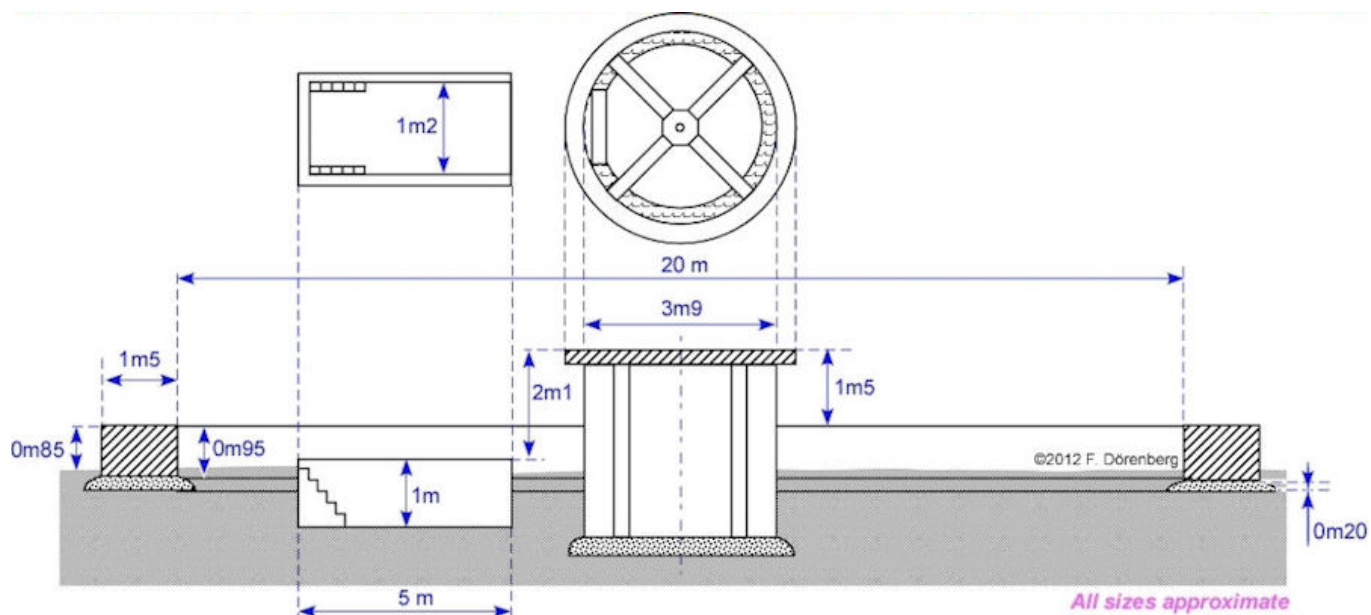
Cross-section of the installation at [Aidlingen/Venusberg](#)
